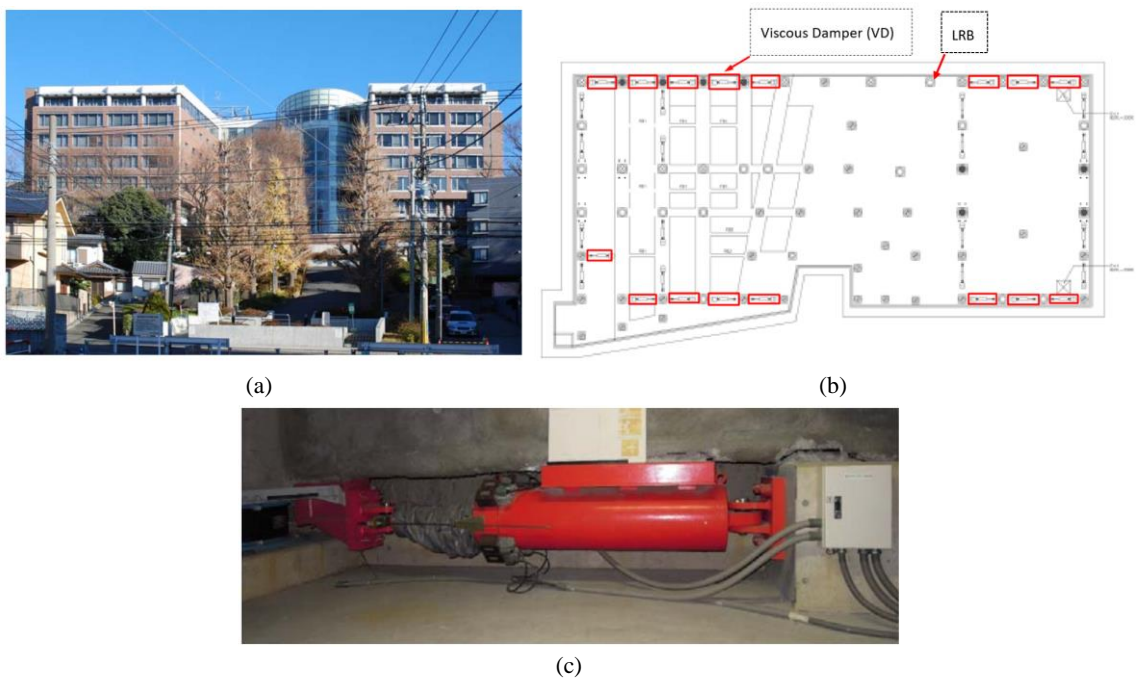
(a) Facade of the Sosokan building, (b) isolation layer plan of the building, and (c) one of the existing viscous dampers in the building's isolation layer [1,20]
